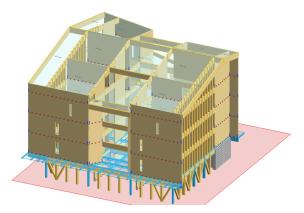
Numerical model of the building: steel, concrete (only at the first story) and timber structural system of one of the two emerging buildings.
